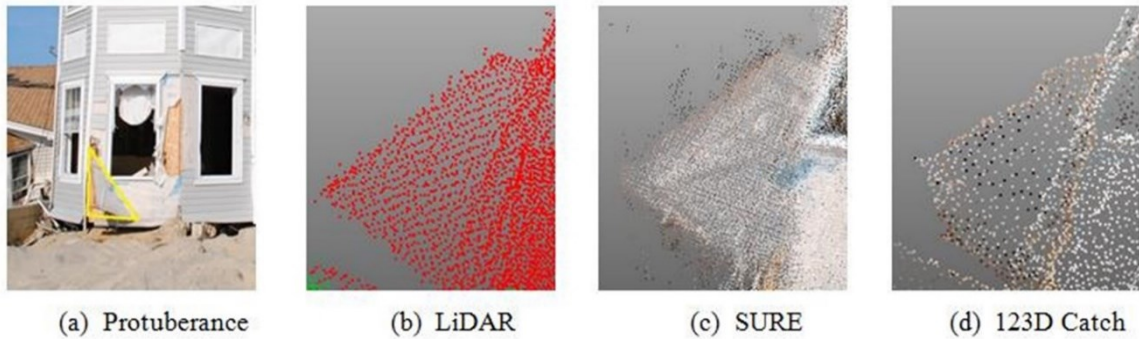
Visualizing Wall Cladding Damages in Point Clouds
